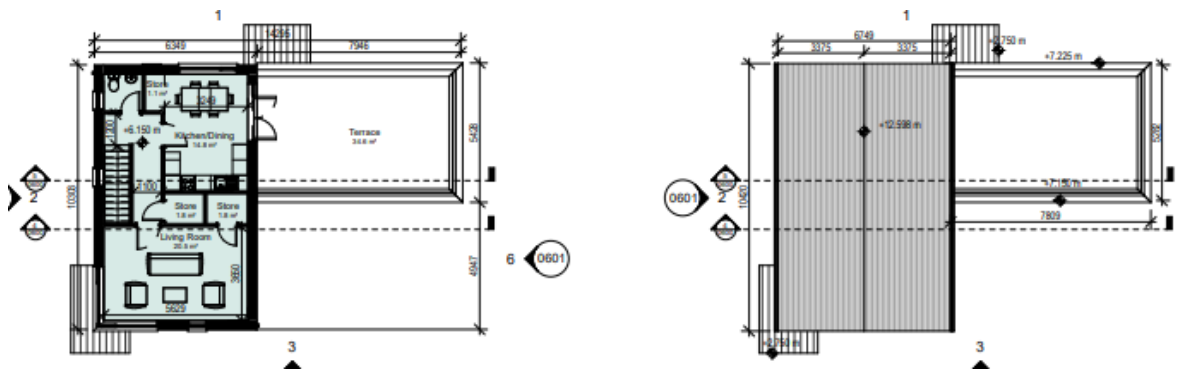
Proposed second (left) and roof (right) floor plans of Duplex Block Type L.
